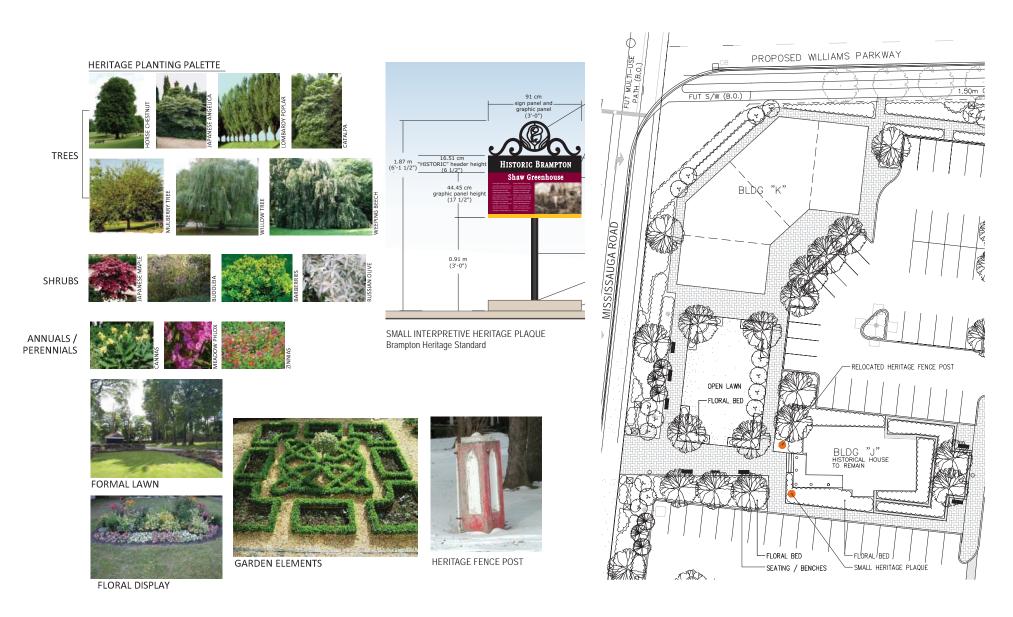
Heritage Building Design Integration Concept Plan
